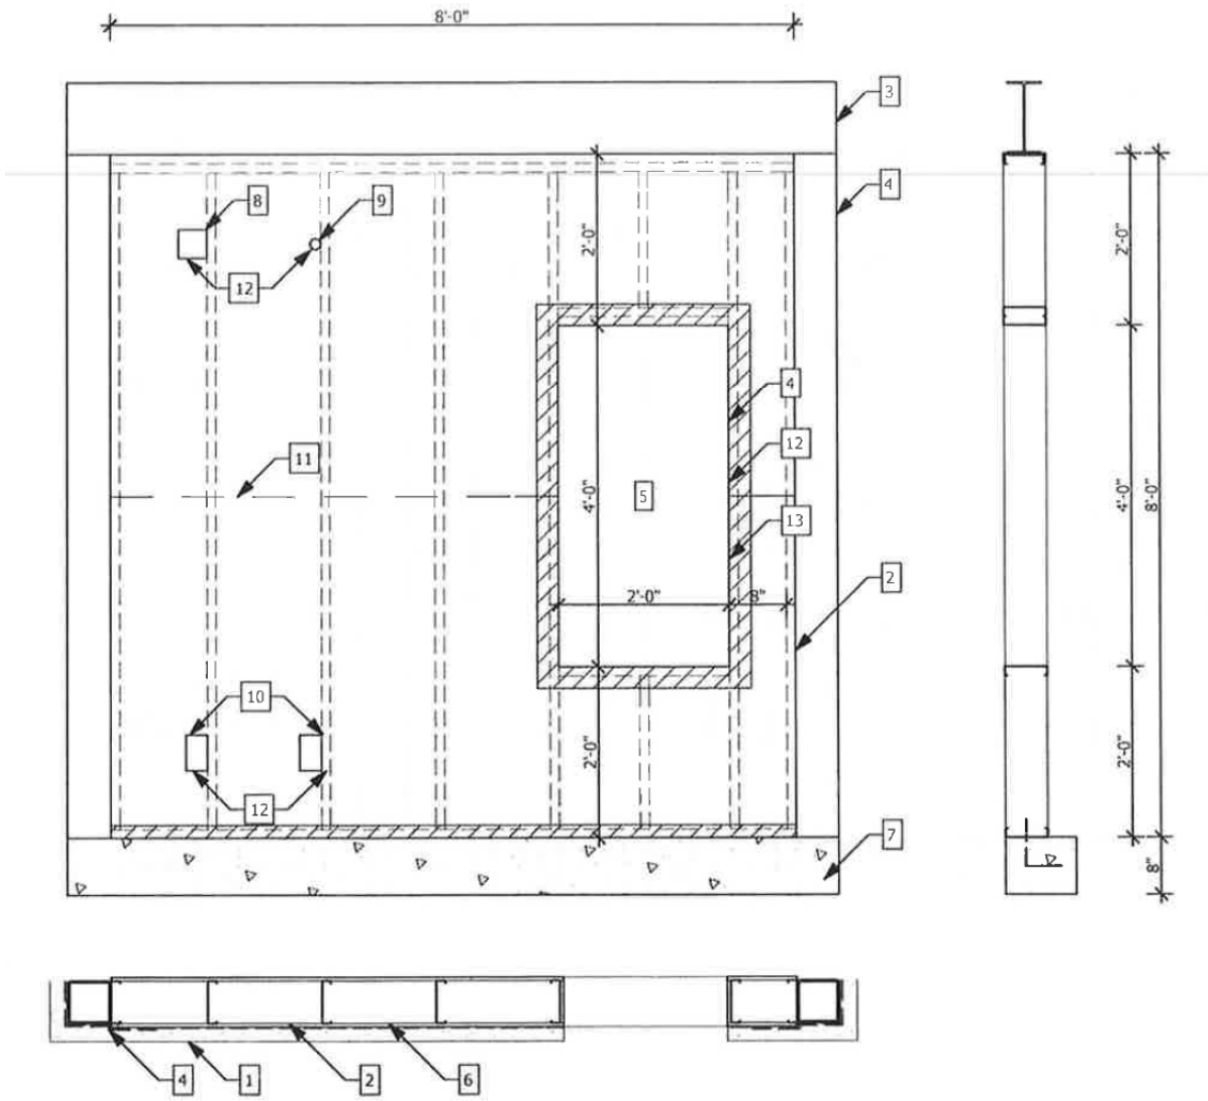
"Icynene ProSeal Air Barrier System" steel stud wall specimen with window, pipe, duct and outlet penetrations continuity details
